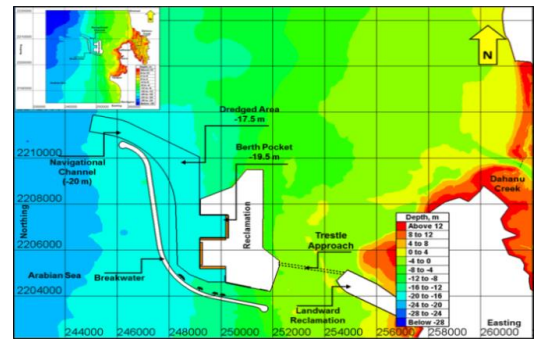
Finalised Master Plan & Phase-I Layouts of Proposed Port at Vadhavan
